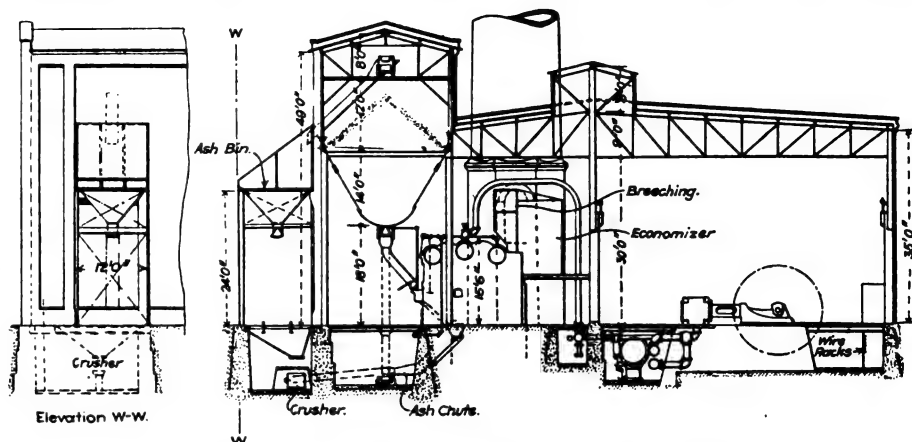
CROSS-SECTIONAL ELEVATION OF POWER HOUSE.
